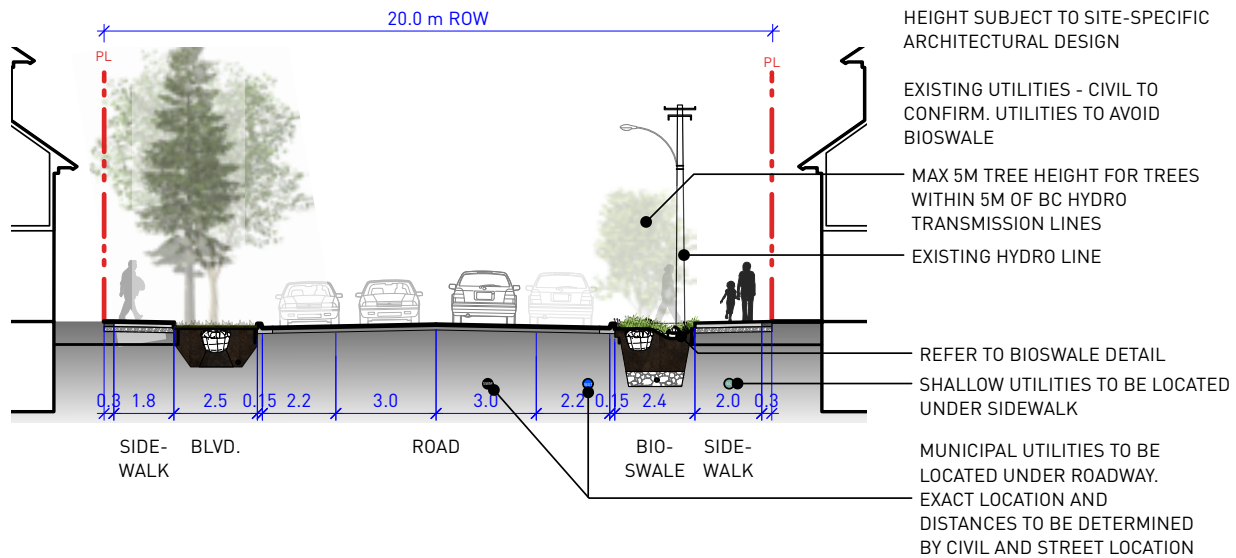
SECTION 1 - TYPICAL STREETSCAPE
